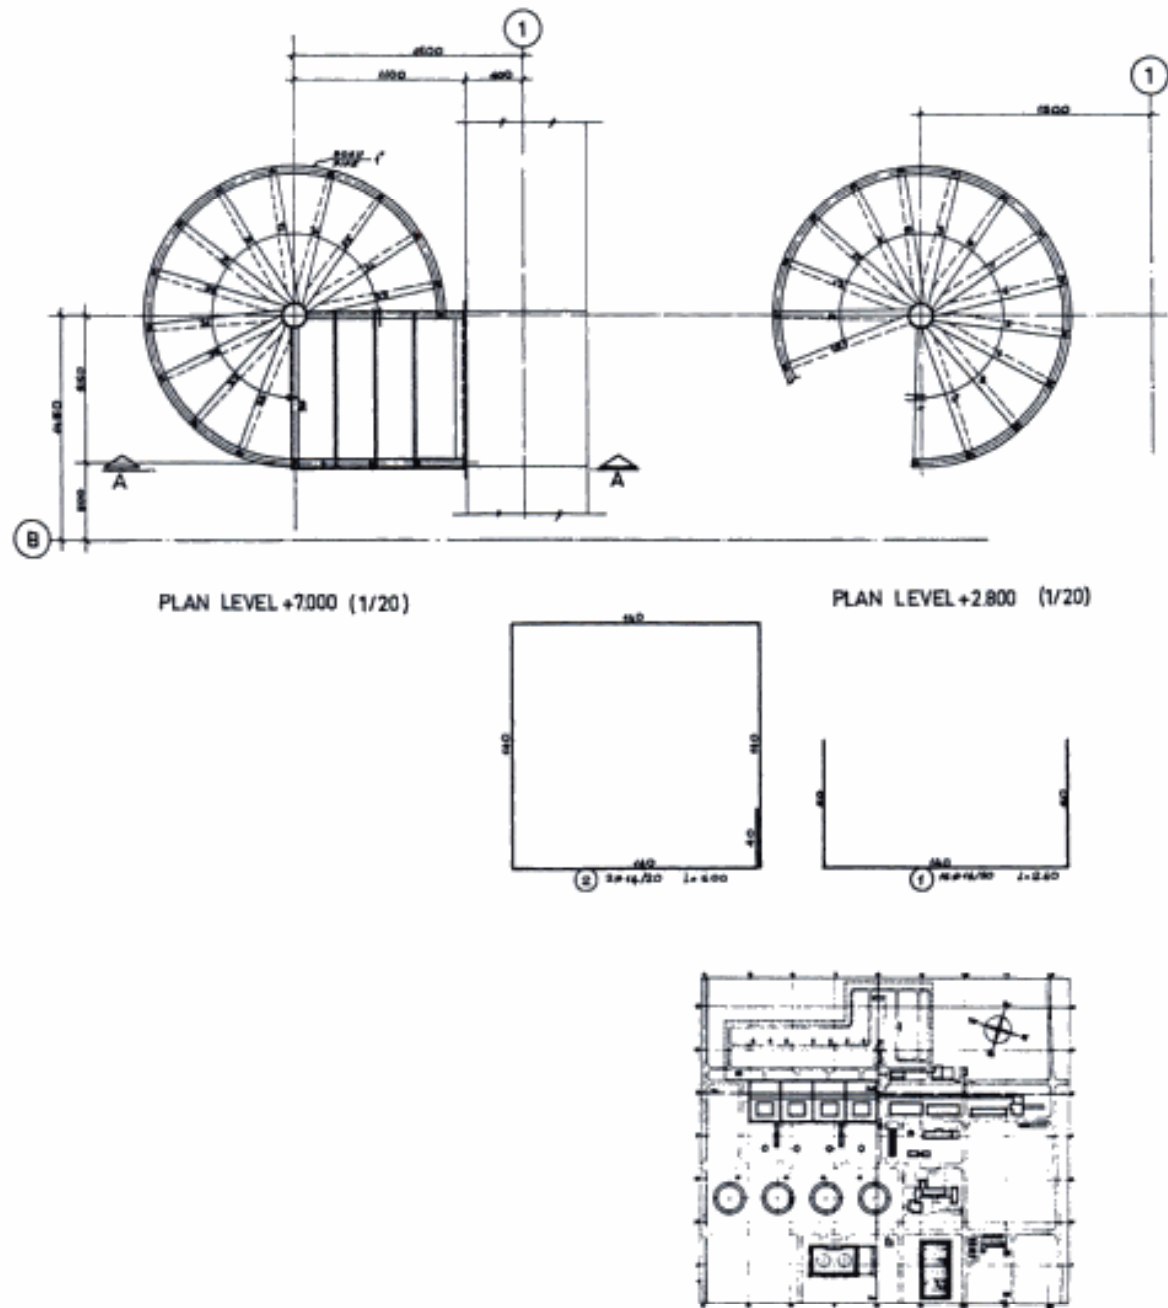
Steel helical staircase – Elevations, plans and structural details (Turkish/European practice).
